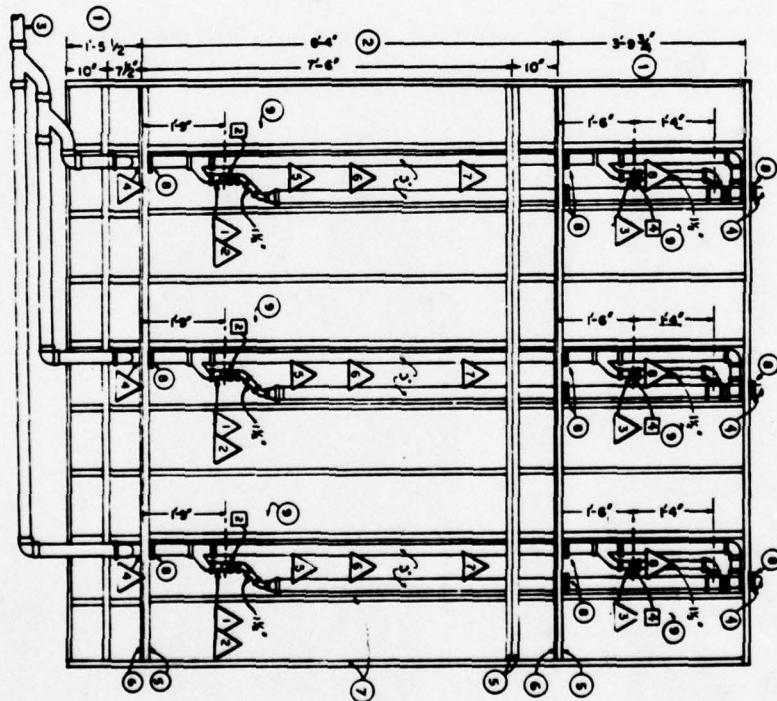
Drawing showing the construction of a UCB test specimen with three plumbing cavities. The rectangular shaded areas around each lateral represent the 24-gauge galvanized steel sheets which protect the back-to-back lateral penetrations.
